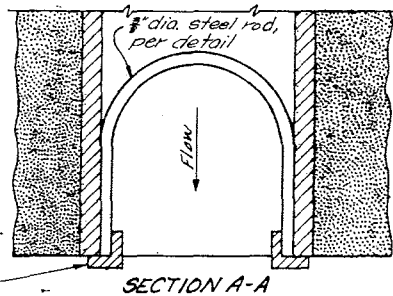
DETAIL OF CONSTRUCTION JOINT AND DRAIN OUTLET
